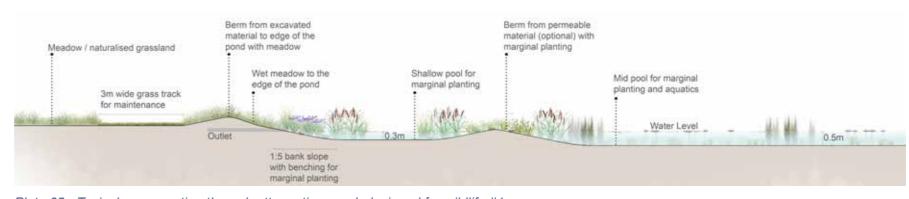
Typical cross section through attenuation pond, designed for wildlife #1
